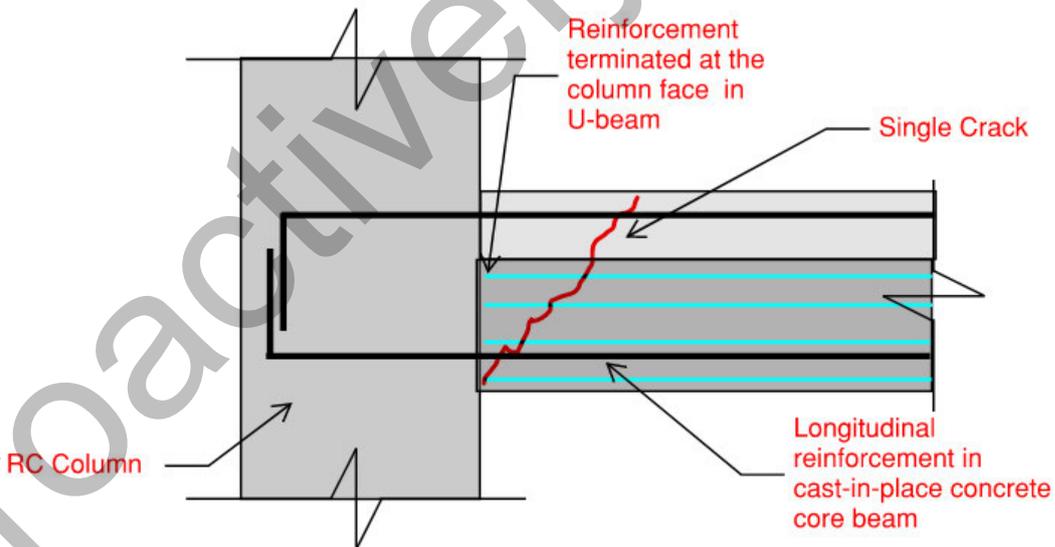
Typical RC beam section - potential single crack in the plastic hinge zone
